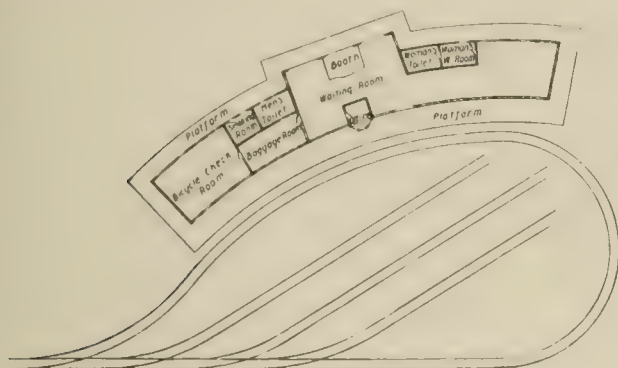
PLAN OF TERMINAL AT OLCOTT BEACH.
